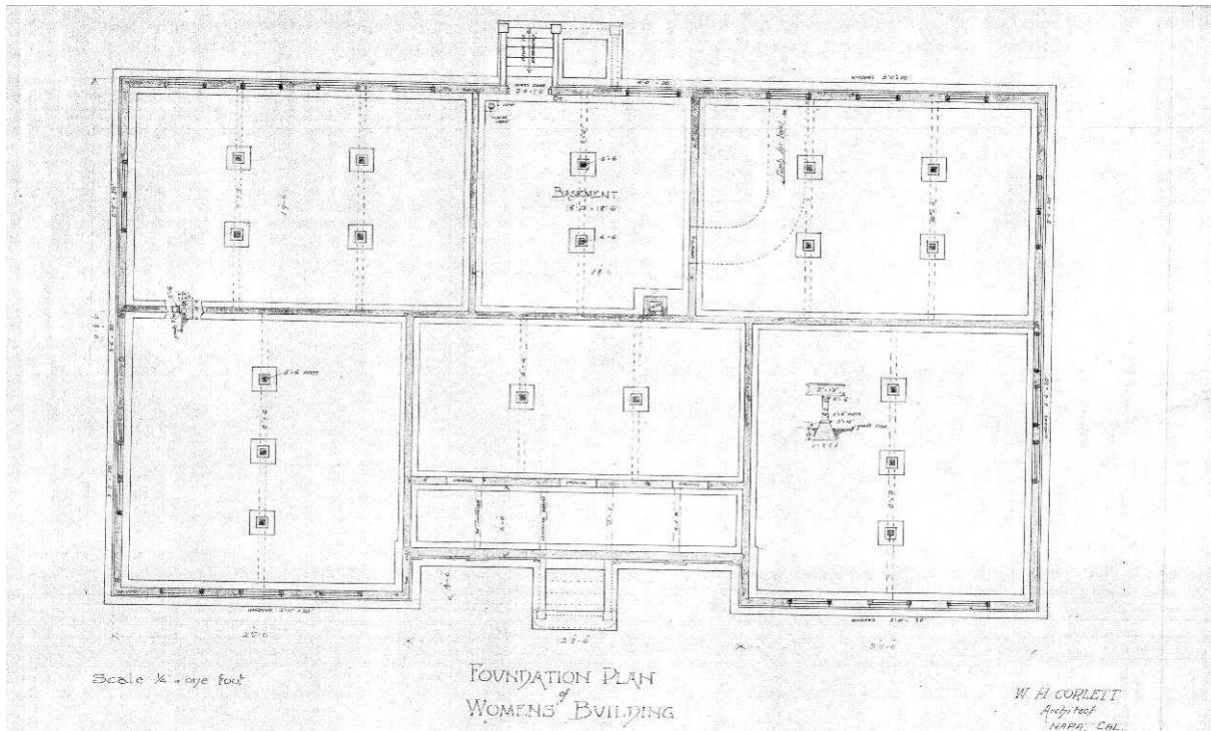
W.H. Corlett, Foundation Plan of Women's Building, undated c1912.
